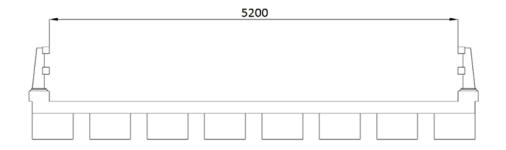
Typical Proposed Cross Section for Delegate River Bridge
